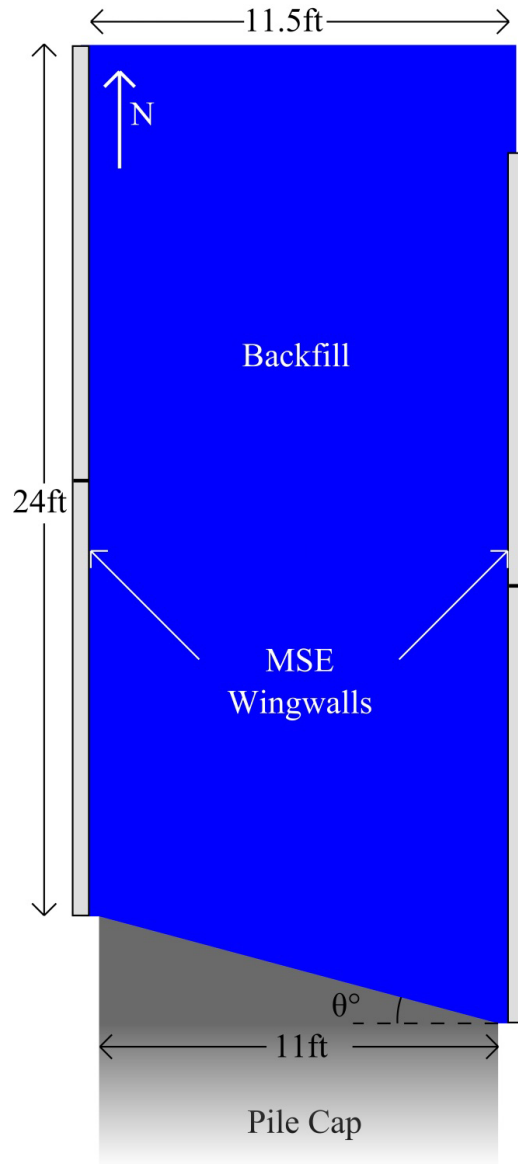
MSE wingwall layout for large-scale testing (Franke 2013).
